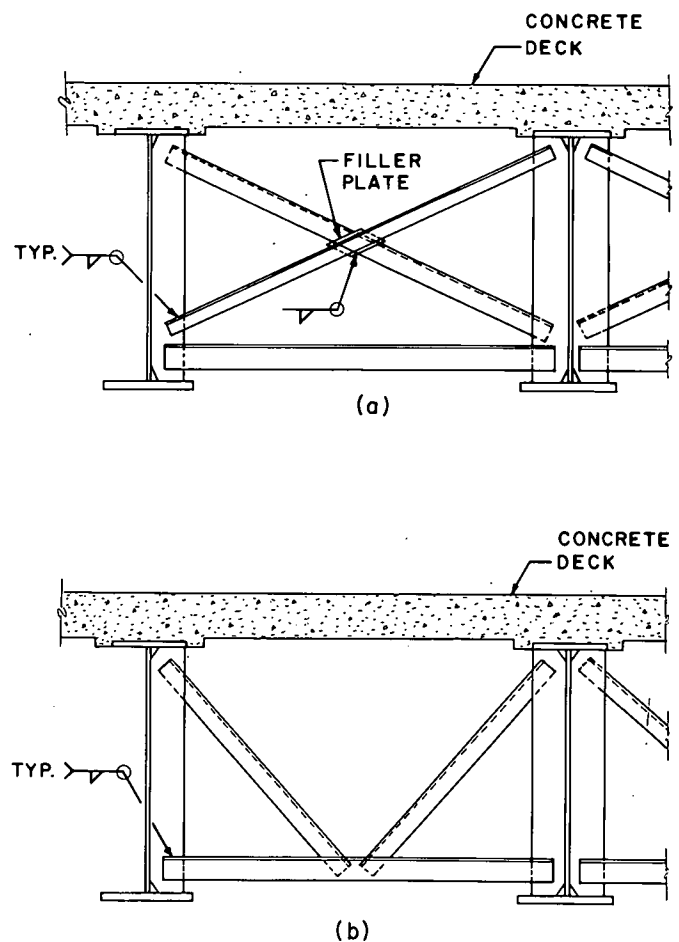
Cross bracing details: (a) X-bracing; (b) K-bracing.
